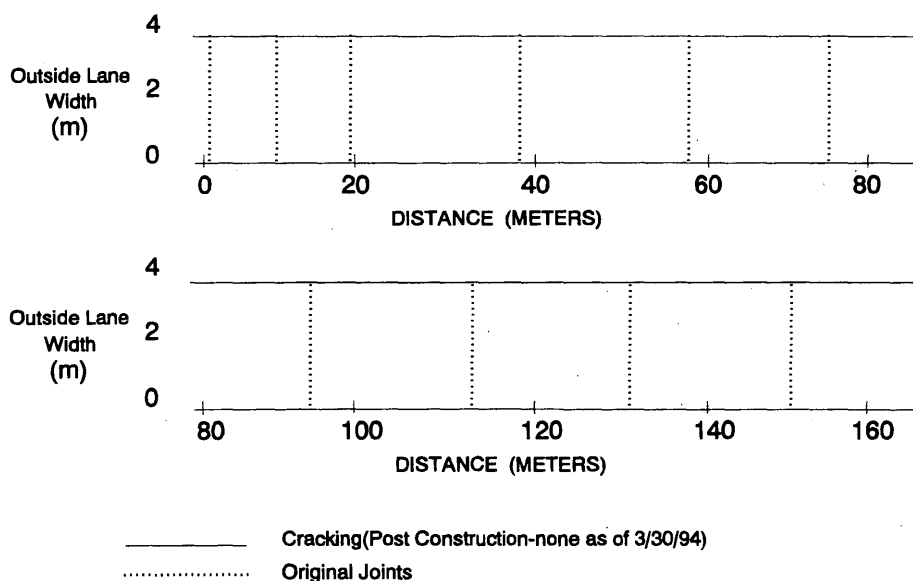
Distress summary for test section 400608 [0.2 m (8 in.) rubblized with drain].
